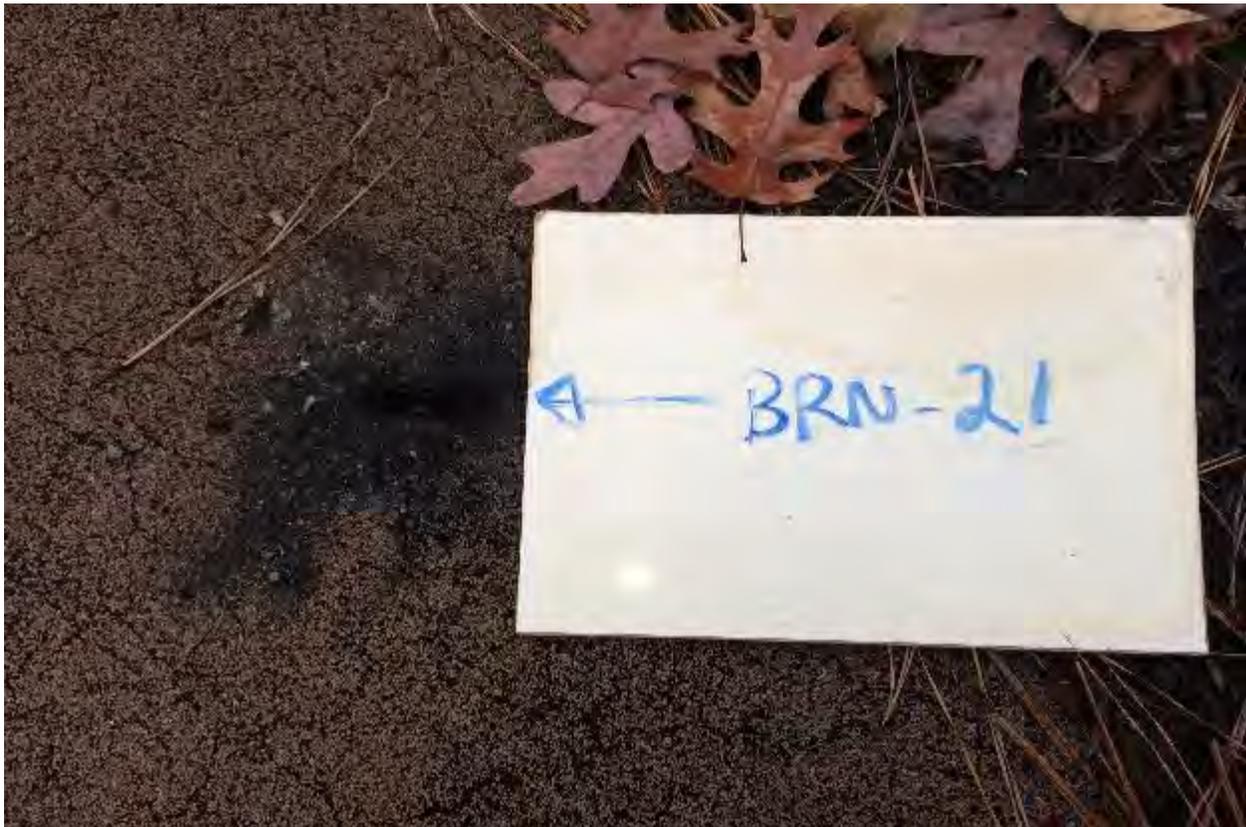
Laboratory analyses did not detect asbestos minerals within asphalt roof sample BRN-21 collected from the North Administrative Building roof.
